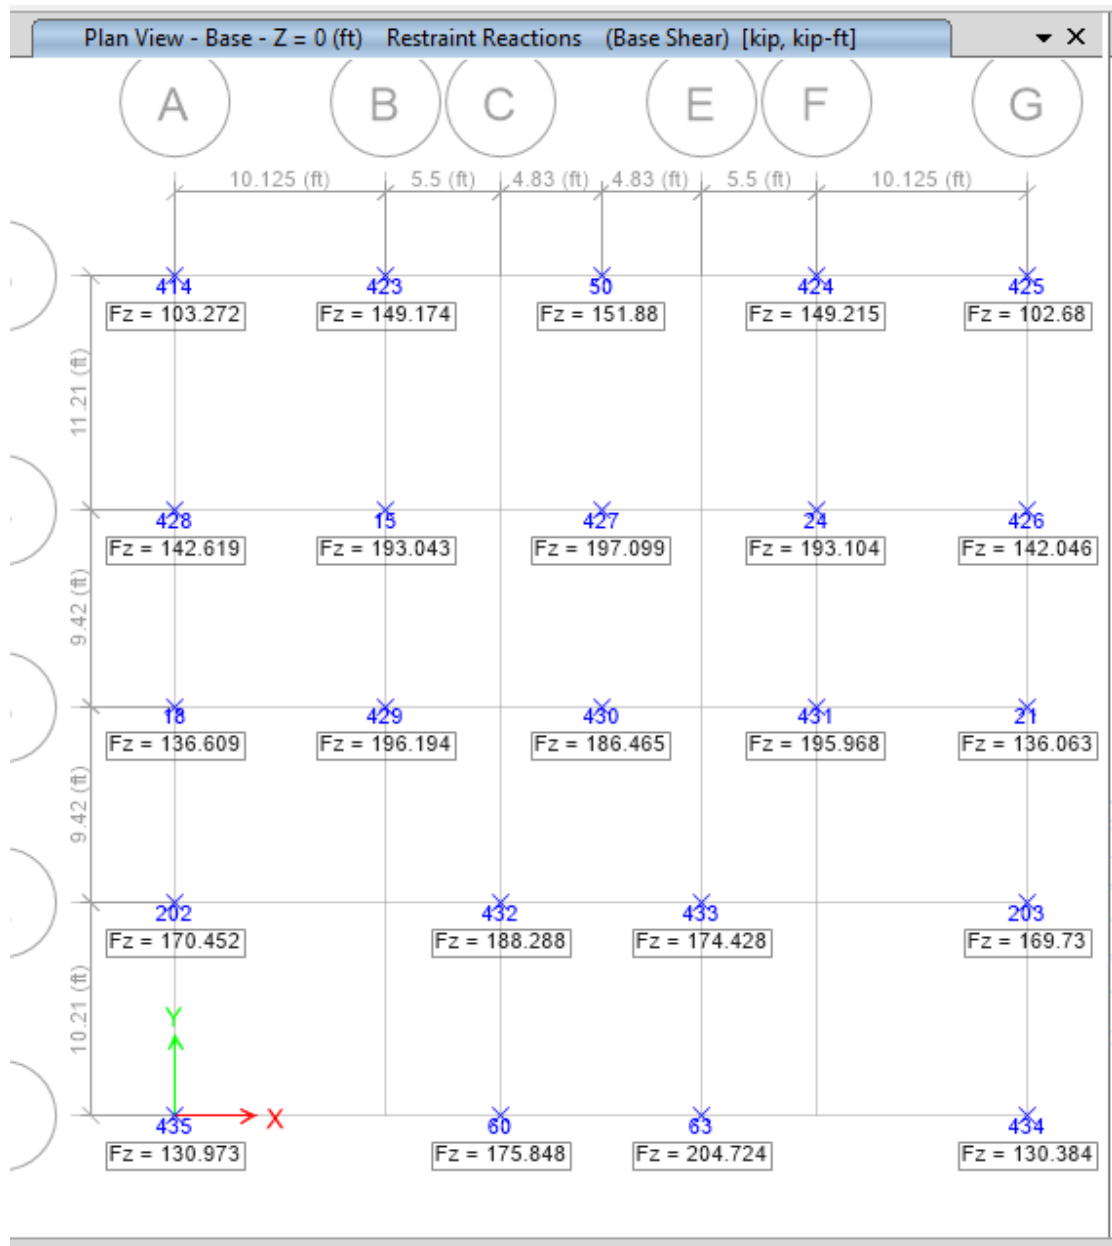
Base Shear Reaction of (G+6) storied Building using ETABS
